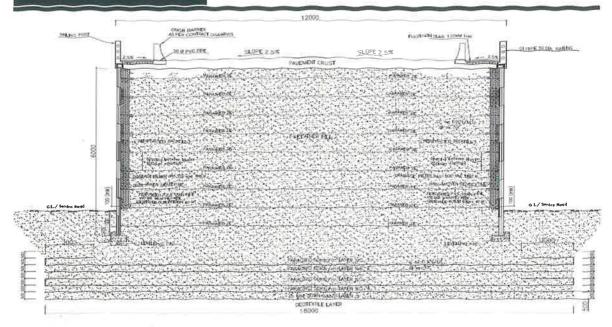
Cross-Section of Reinforced Soil wall for 6 m height near abutment
